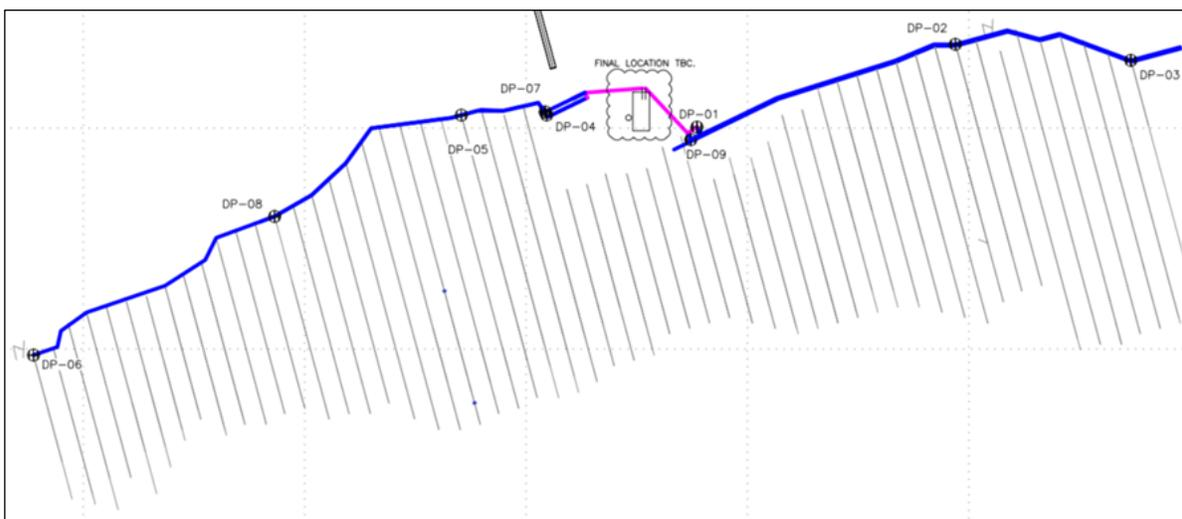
Schematic Diagram of Underground Workings – Pipeline Profile (Plan View)
